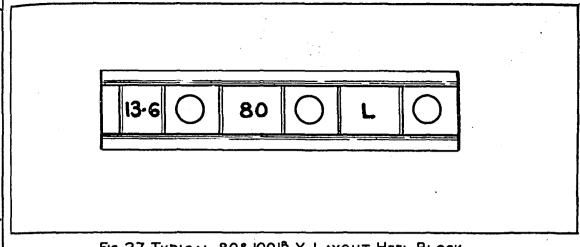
TYPICAL 80& 10018. Y LAYOUT HEEL BLOCK
